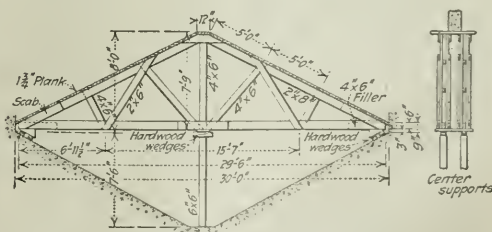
FALSEWORK FOR TRANSVERSE WALL FORMS
